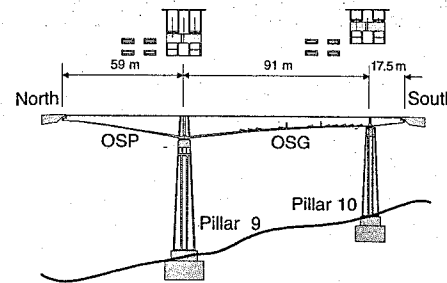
Longitudinal section of the cast – in Place Balanced Cantilever Beam – “Colle Isarco Bridge”.
